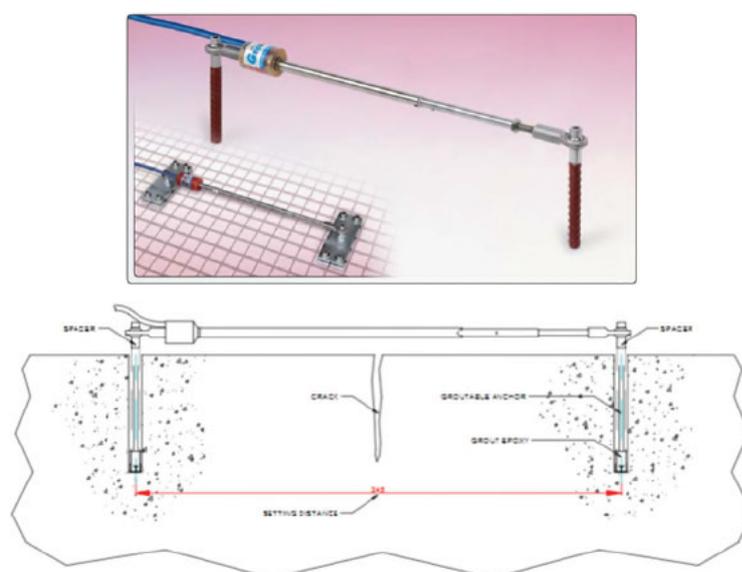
Typical Geokon Model 4420 installation and proposed installation
